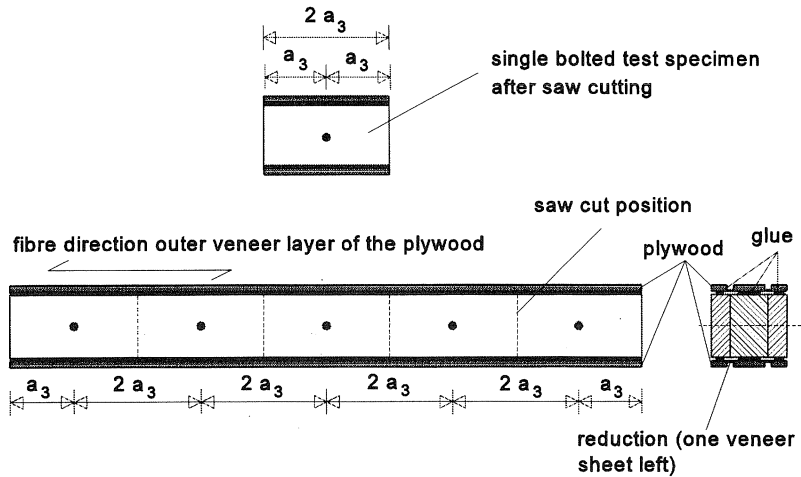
Manufacturing of the test specimens for the single bolted connections.
